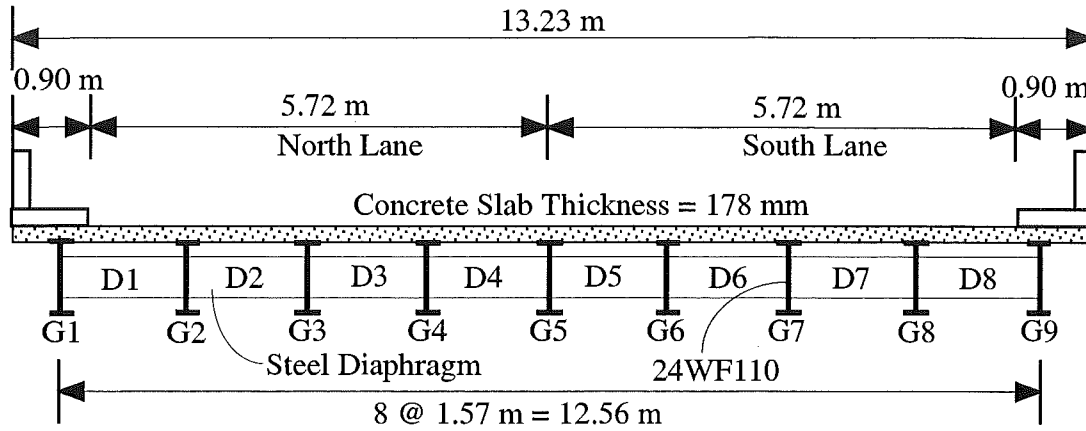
Cross-Section of the Bridge M43/SC (B02-23041).
